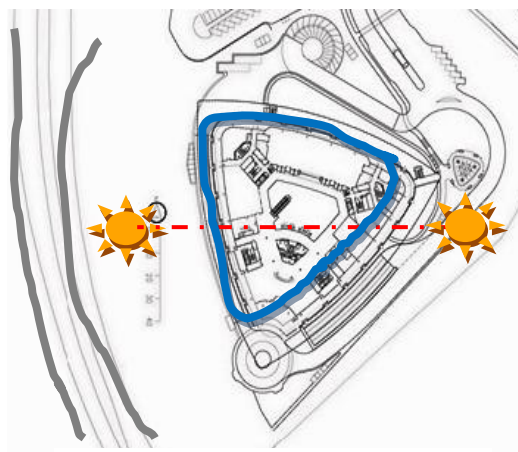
The site plan of the Securities Commission Building, (Kasturi, 2006)
